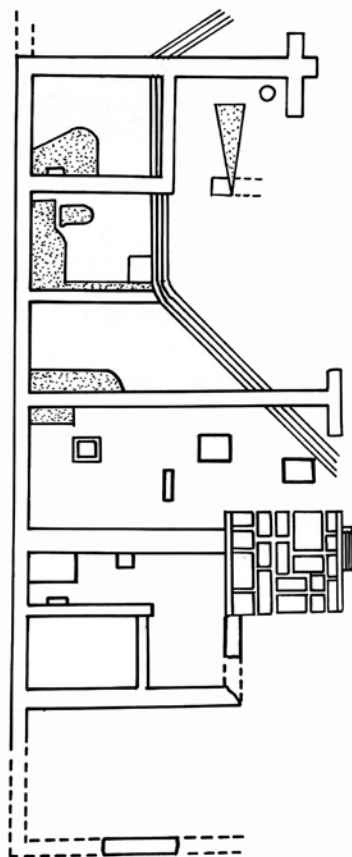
Plan of building in the foundations of housing block B 12 at Sedmi septemvri str.
